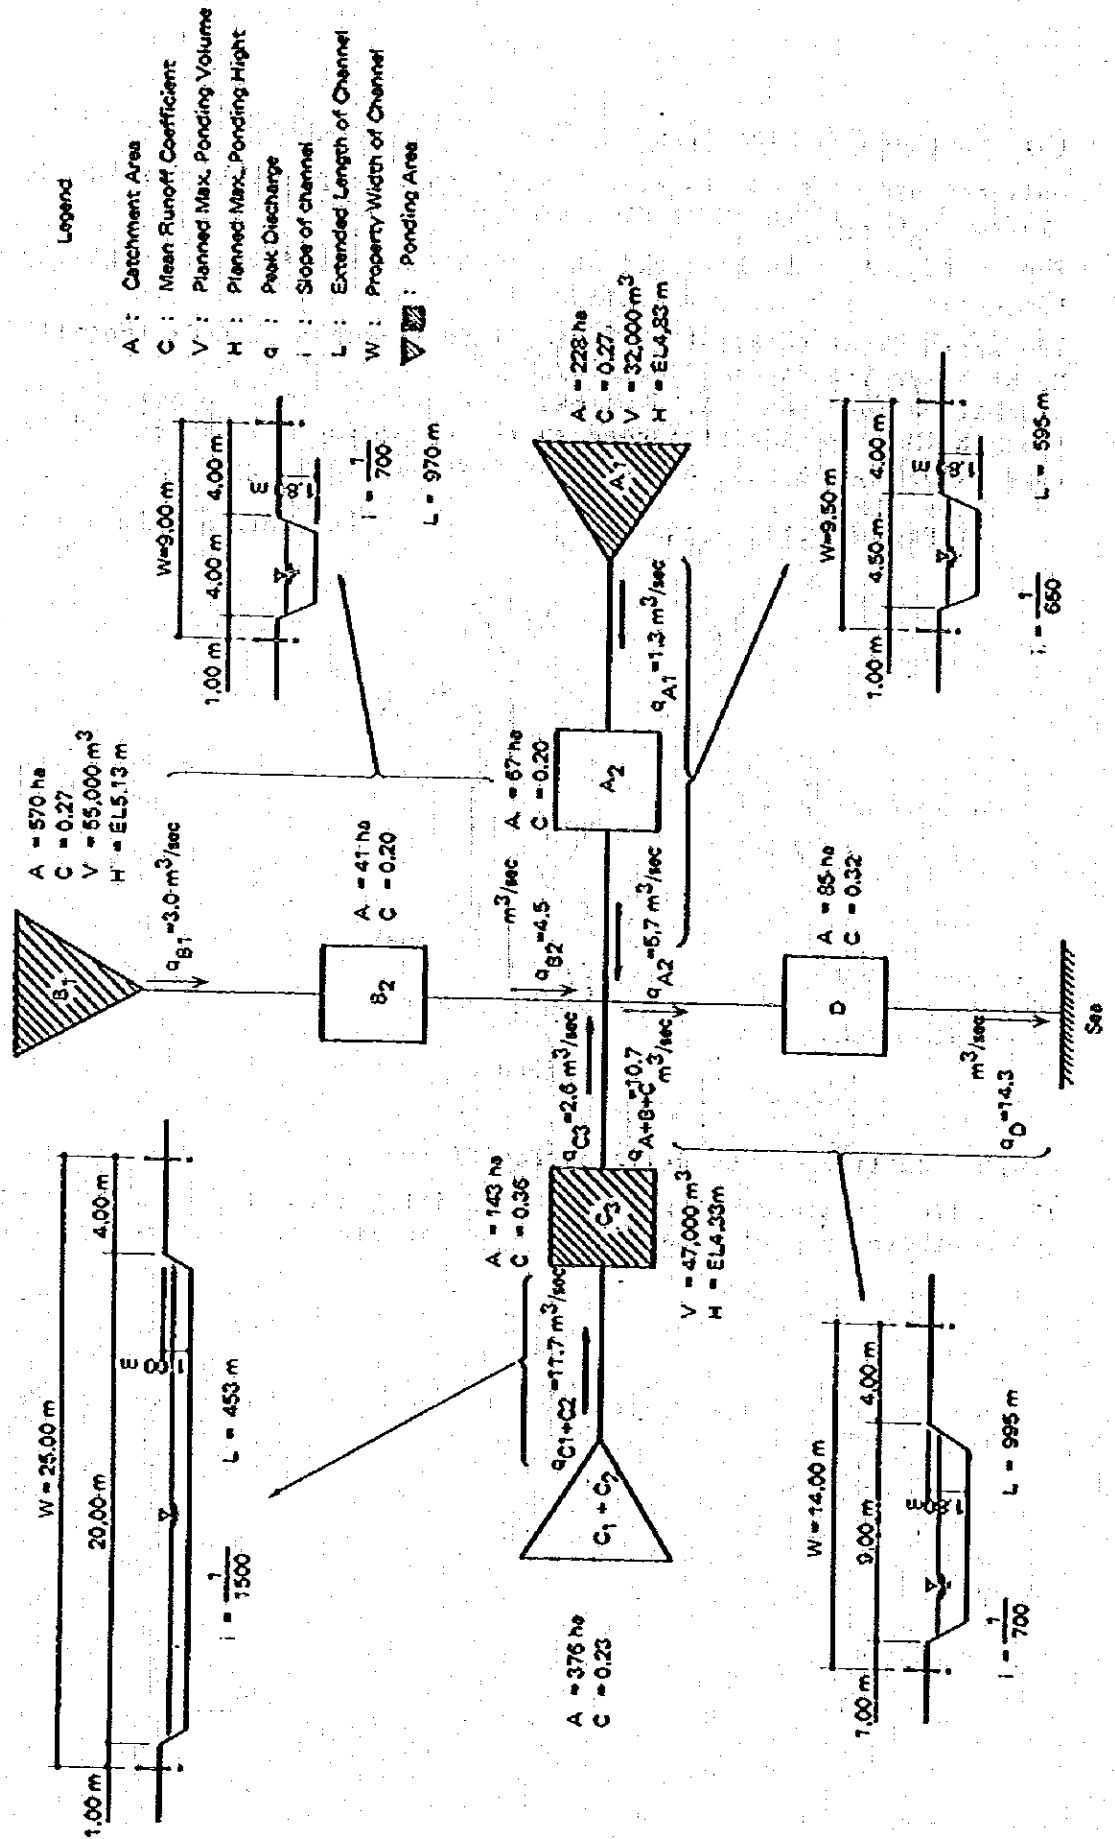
Outline of Drainage Facilities (Central Pattaya Area, Alternative Plan 2)
